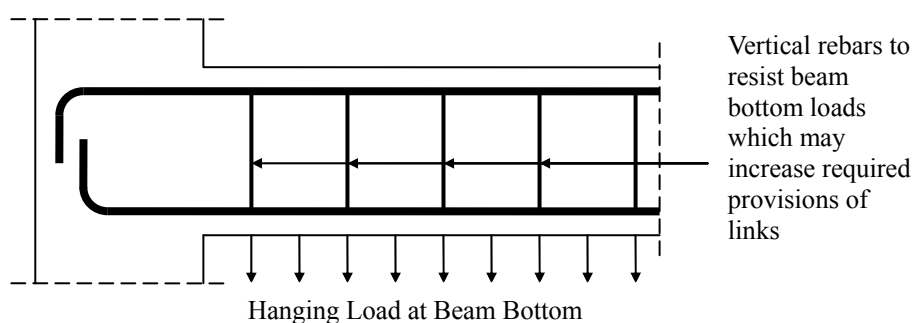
Vertical Rebars to Resist Hanging Load at Beam Bottom
